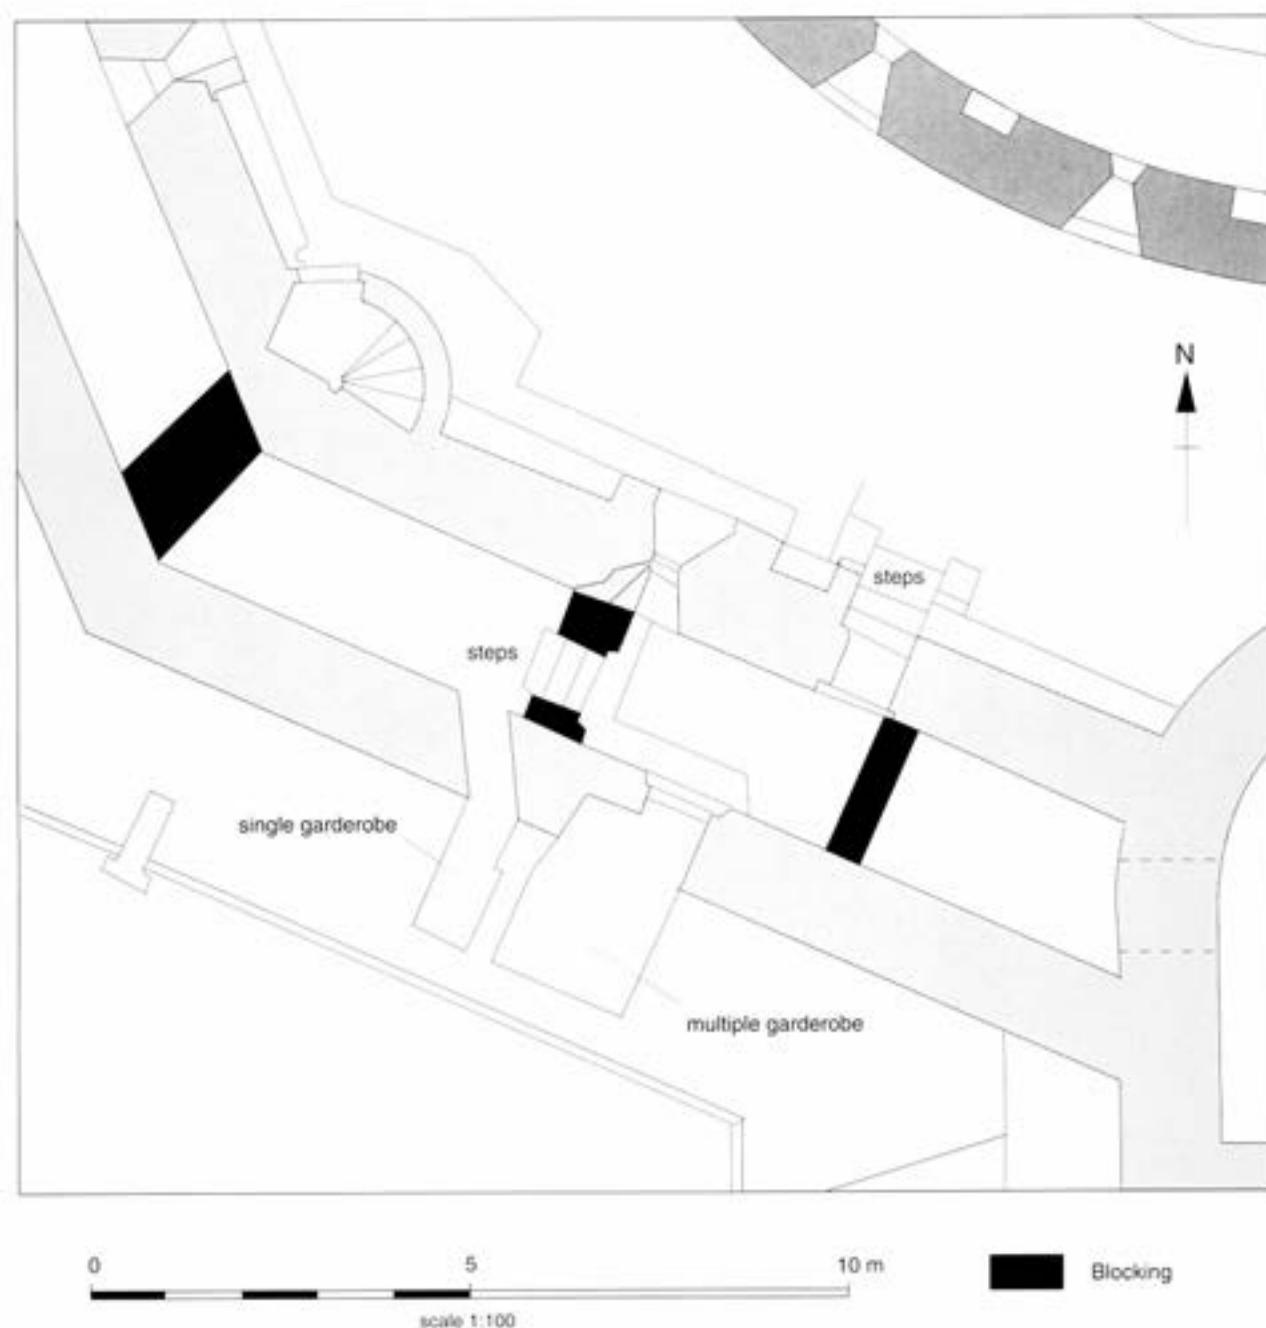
SW Curtain Wall; detail showing blockings and garderobes
